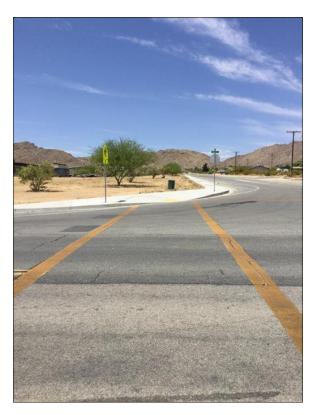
Intersection of Sunburst Ave. and Calle los Amigos facing west.
